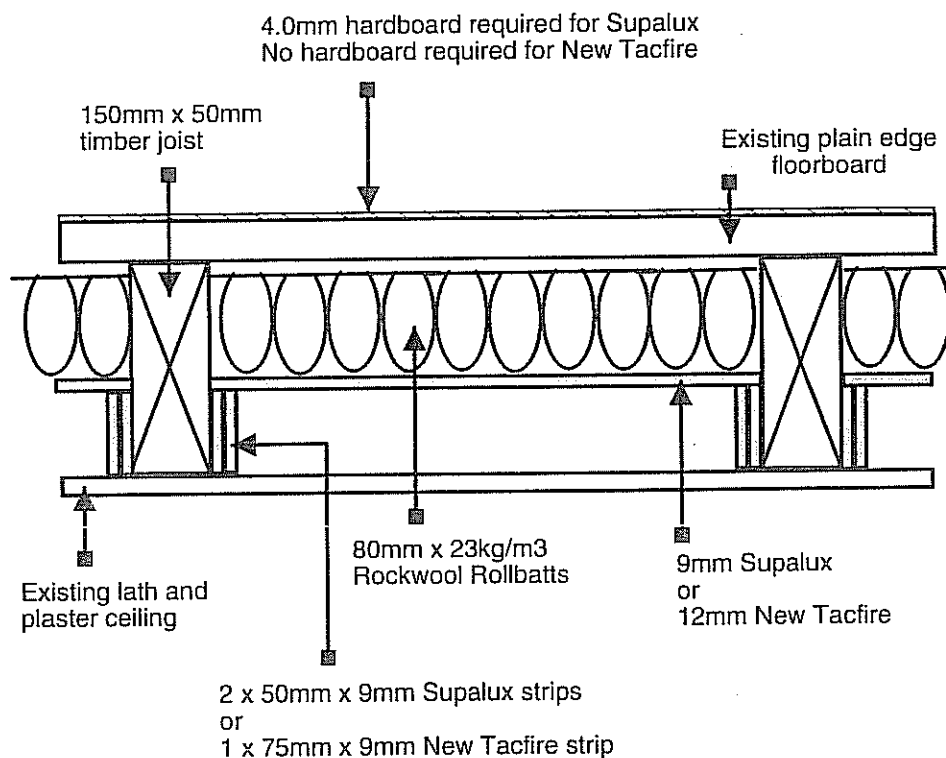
Use of Rockwool and Supalux or New Tacfire above an existing ceiling to provide 60 minutes fire resistance
